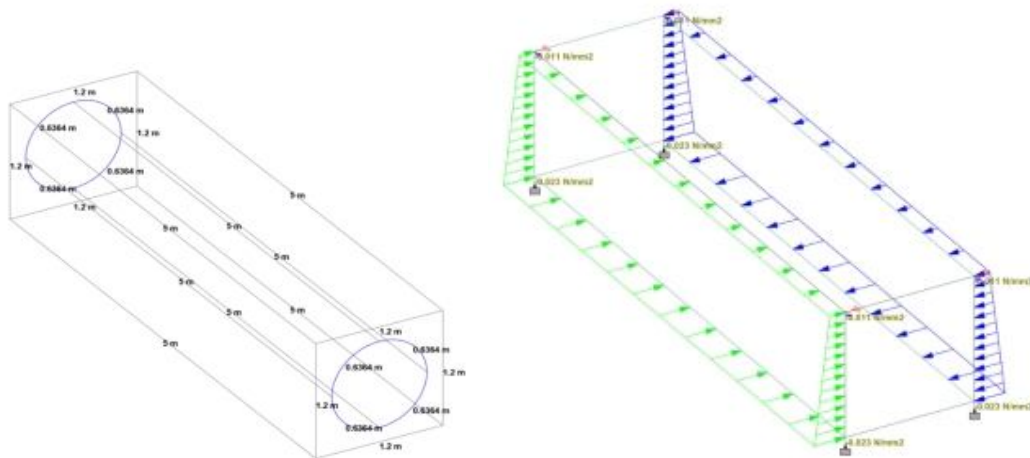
a (culvert geometry) and b (soil pressure distribution on culvert)
